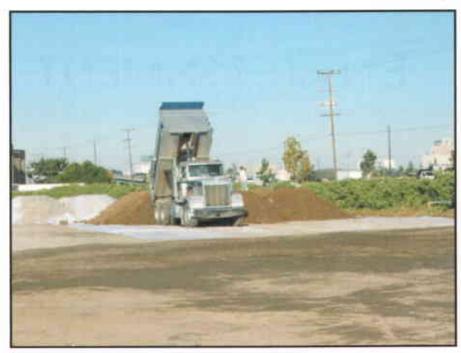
Sand and soil fill from the Building 1 foundation was stockpiled along the northern portion of the Site.
